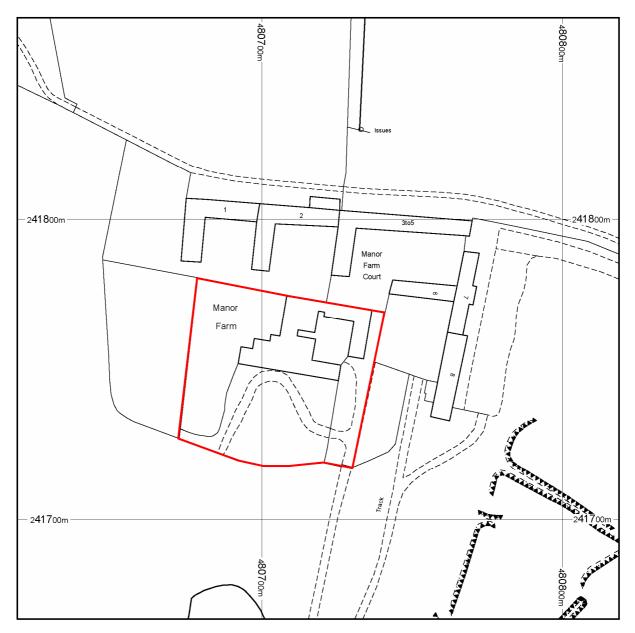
Site plan, showing area affected by present proposals (scale 1:1250)
